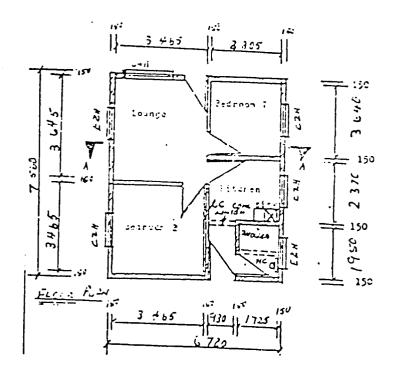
FIGURE FLOOR PLAN OF POPULAR HOUSE TYPE IN GWERU
